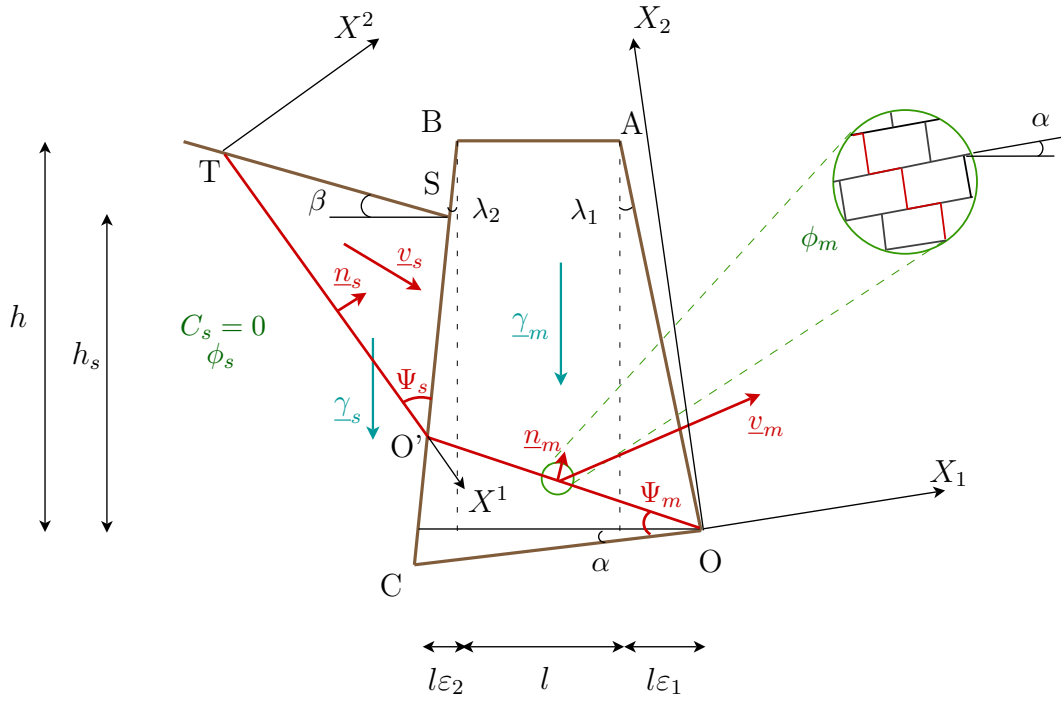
Dry-joint retaining wall modelling: hypotheses of geometry, loading and yield criterion, and failure modes.
